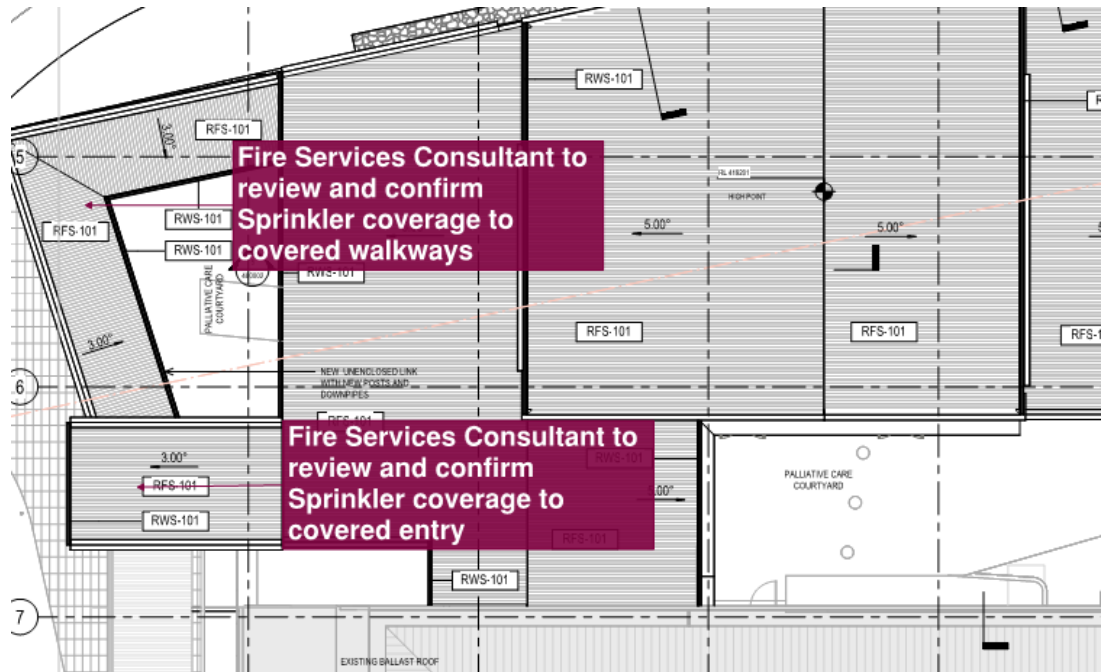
Confirmation required as to sprinkler coverage to covered walkways and covered entry
